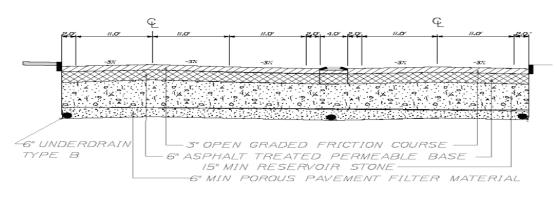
Cross section of porous asphalt system on Maine Mall Road | Source: Maine DOT
